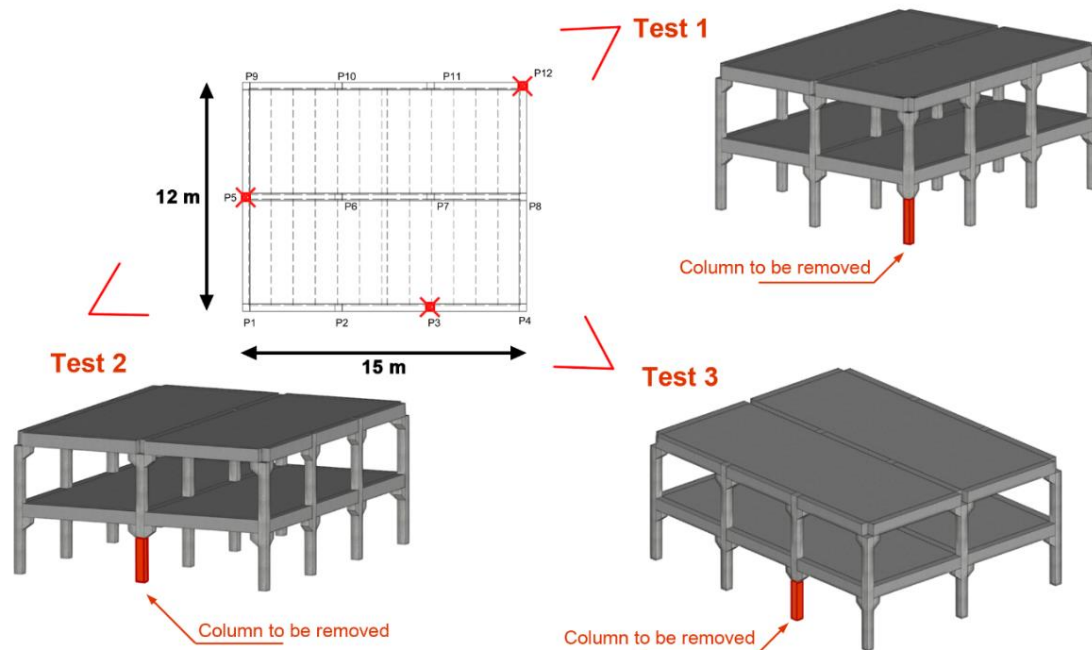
Schematic plan view of test buildings and location of columns suddenly removed during each test.
